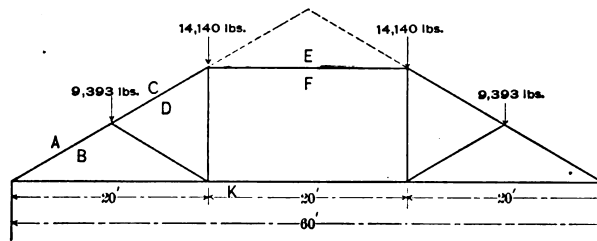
Diagram of Truss Shown in Previous Figure.—Scale, 1-16 Inch to the Foot.
